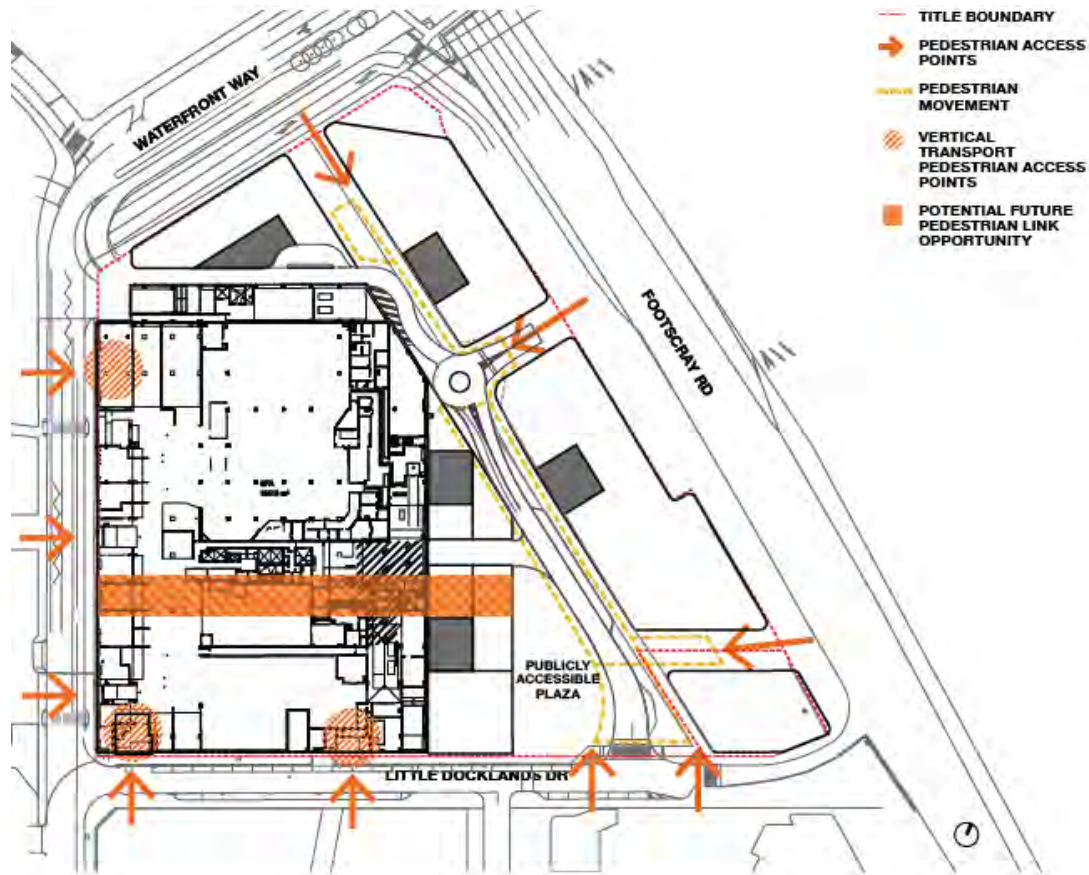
Concept Plan 23 - Movement and Parking Plan 1 - Ground Floor pedestrian paths and access points
